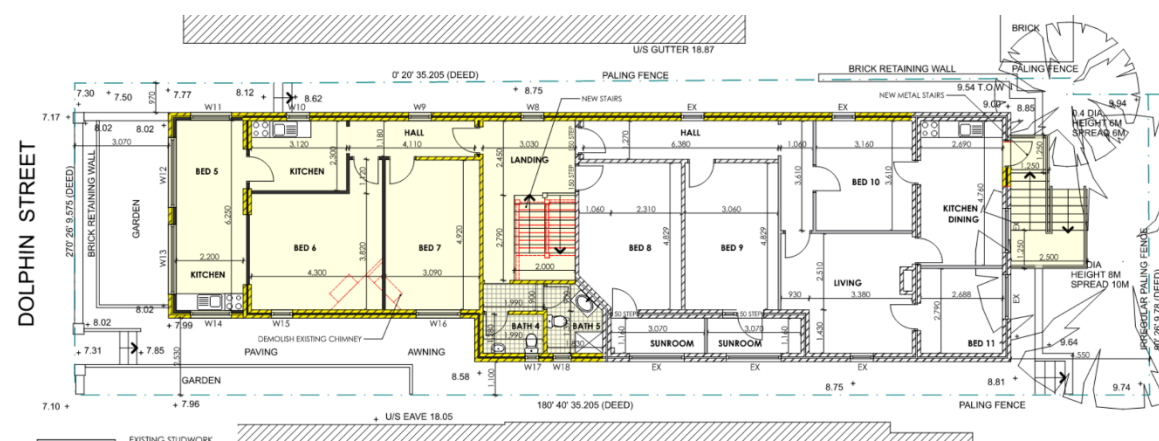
Proposed first floor plan (Source: Brad Inwood Architects)
